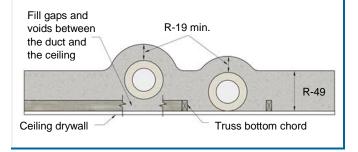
Ducts *deeply buried* in insulation. Insulation depth marker flags shall be installed on the ducts every 10 feet or as approved by the building official.
